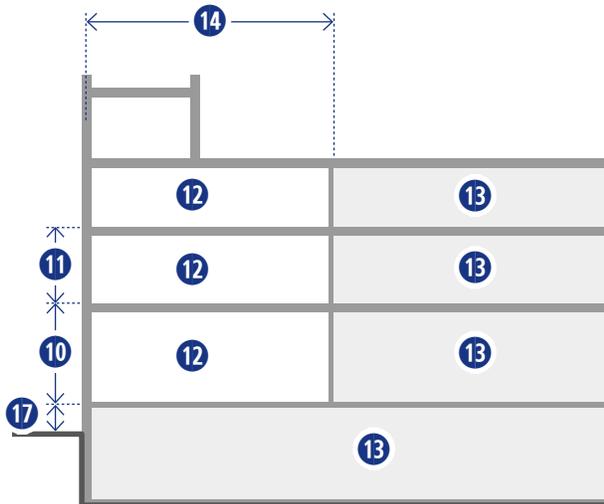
Civic Building: Floor-to-Floor Height & Use Requirements
